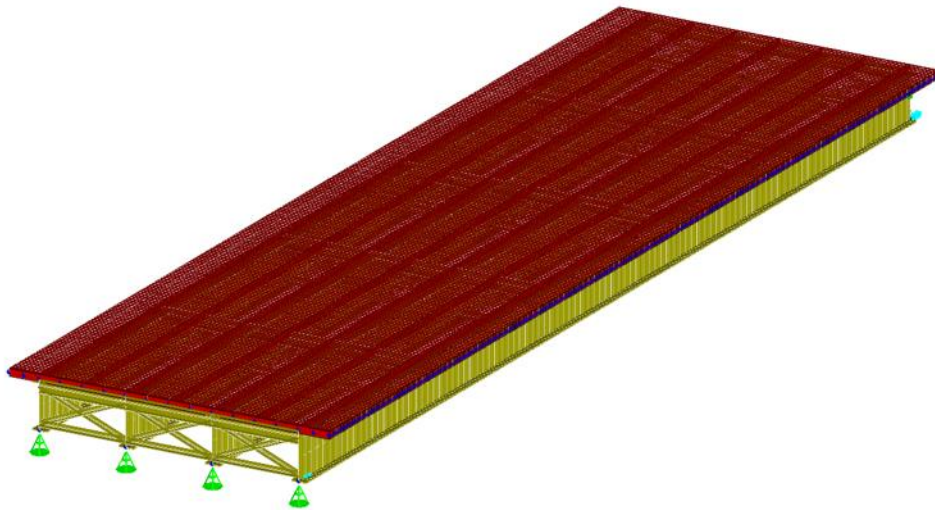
Finite Element Model of a Typical Steel Girder Bridge
